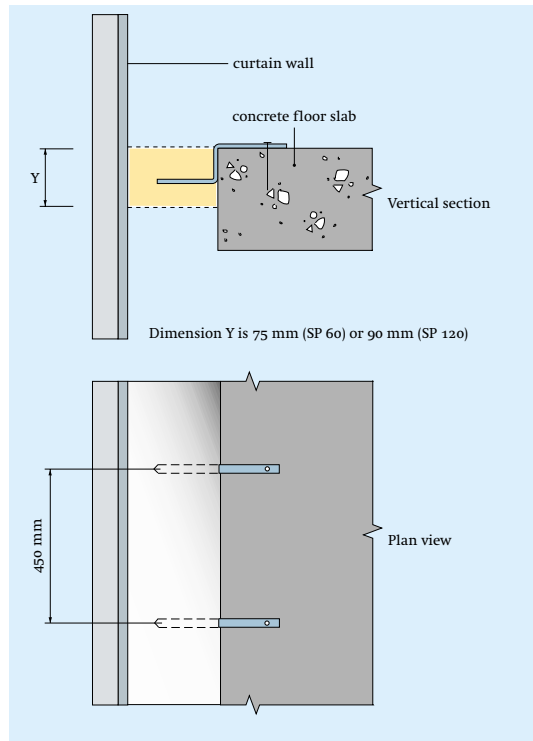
Figure D - Rockwool SP Firestop Slab between floor and curtain wall
